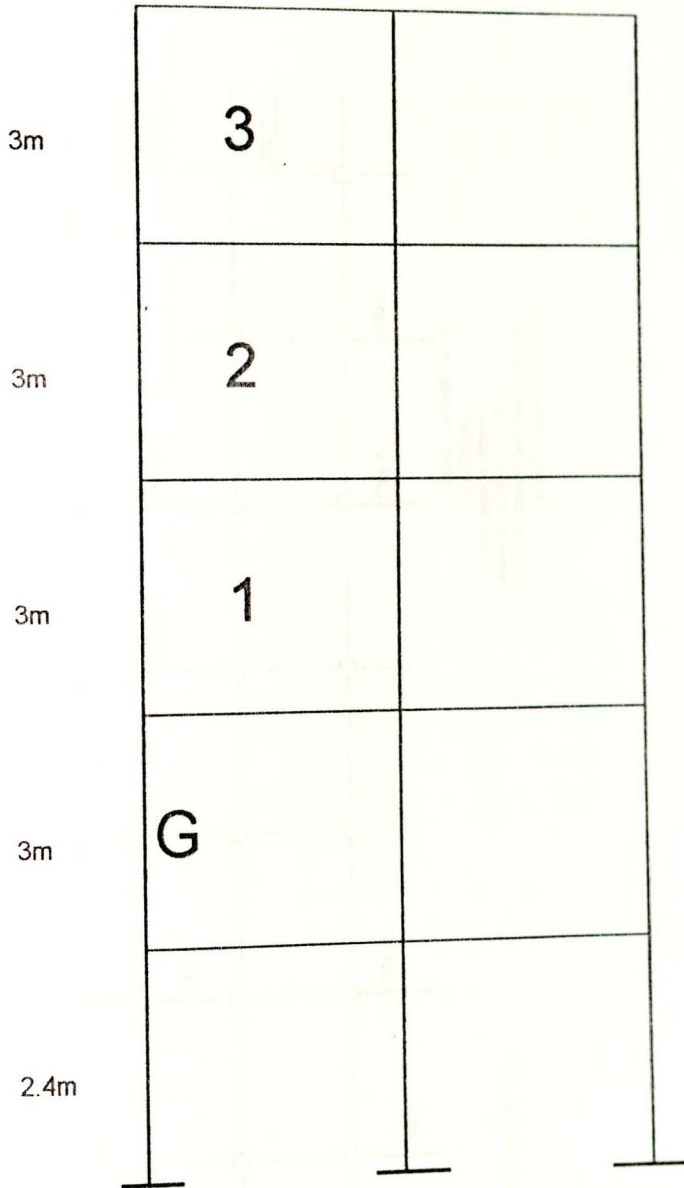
ETHIOPOAN GRAIN TRADE BUILDING ELEVATION (BLOCK A)
